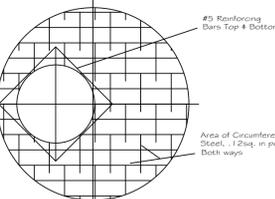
DETAIL OF PRECAST CONCRETE MANHOLE - FLAT TOP
